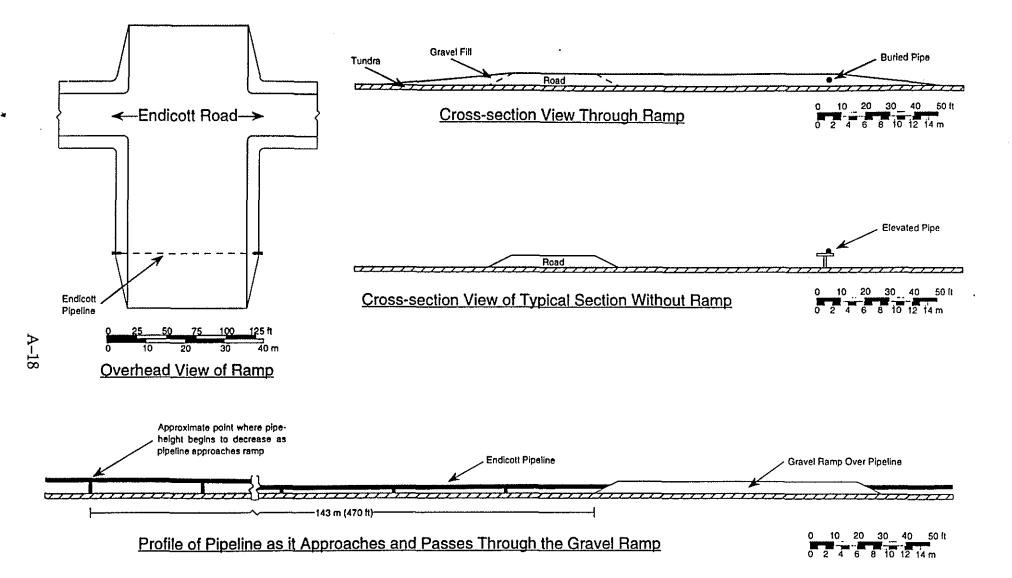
Overhead view of a gravel ramp (section of buried pipeline designed to facilitate caribou passage), cross-section views of the ramp and a typical section of elevated pipeline along the Endicott road, and a profile-view of the pipeline as it approaches and passes through the gravel ramp. The diagrams depict the western-most ramp along the road/pipeline corridor, part of a site (Plot 1) where caribou crossing data were collected during the years 1987-1990 (Lawhead and Smith 1990, Lawhead 1990).
